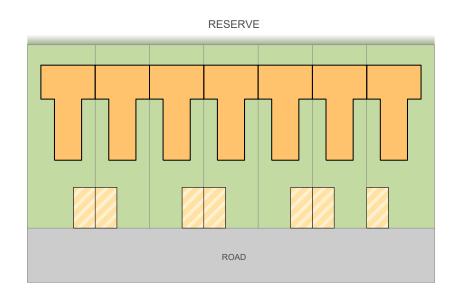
Dwelling Typologies (Townhouse)
